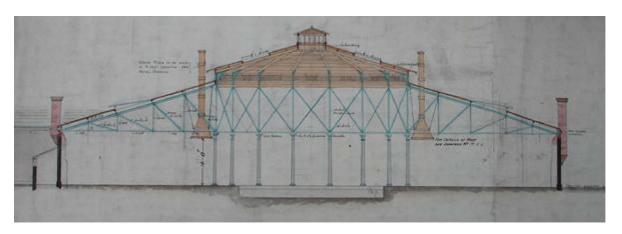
Cross-section of RH1, with new roof c. 1890 designed by W. Bell (NA RAIL 527.590)
